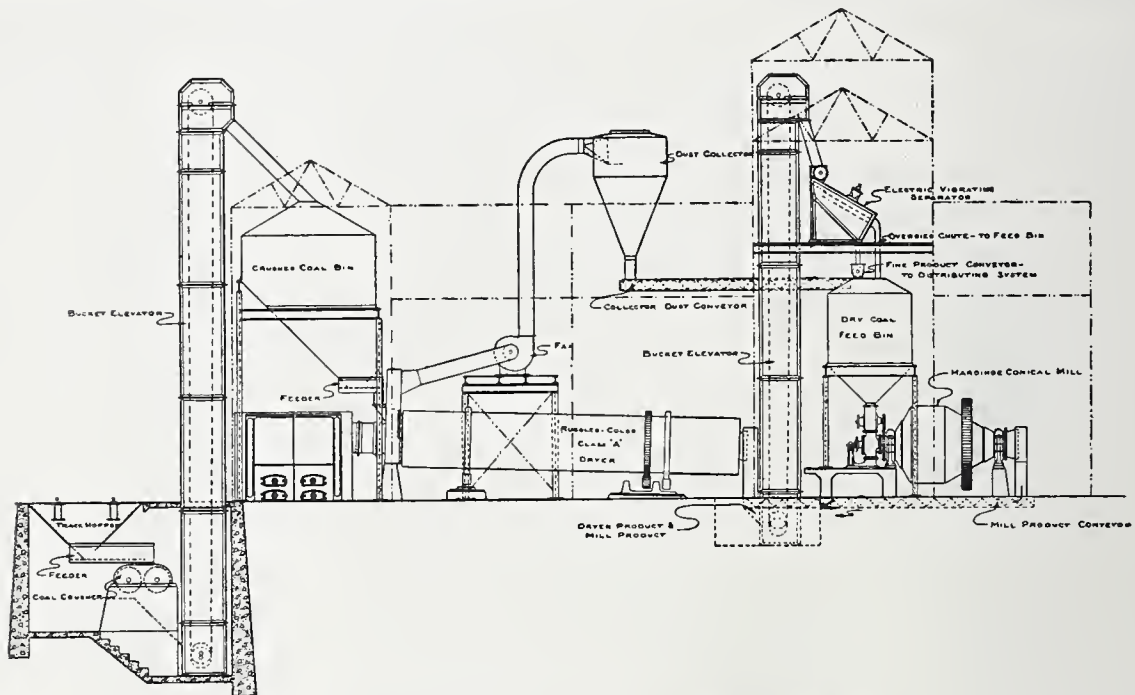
Typical Hardinge Mill Pulverised Fuel Plant.
